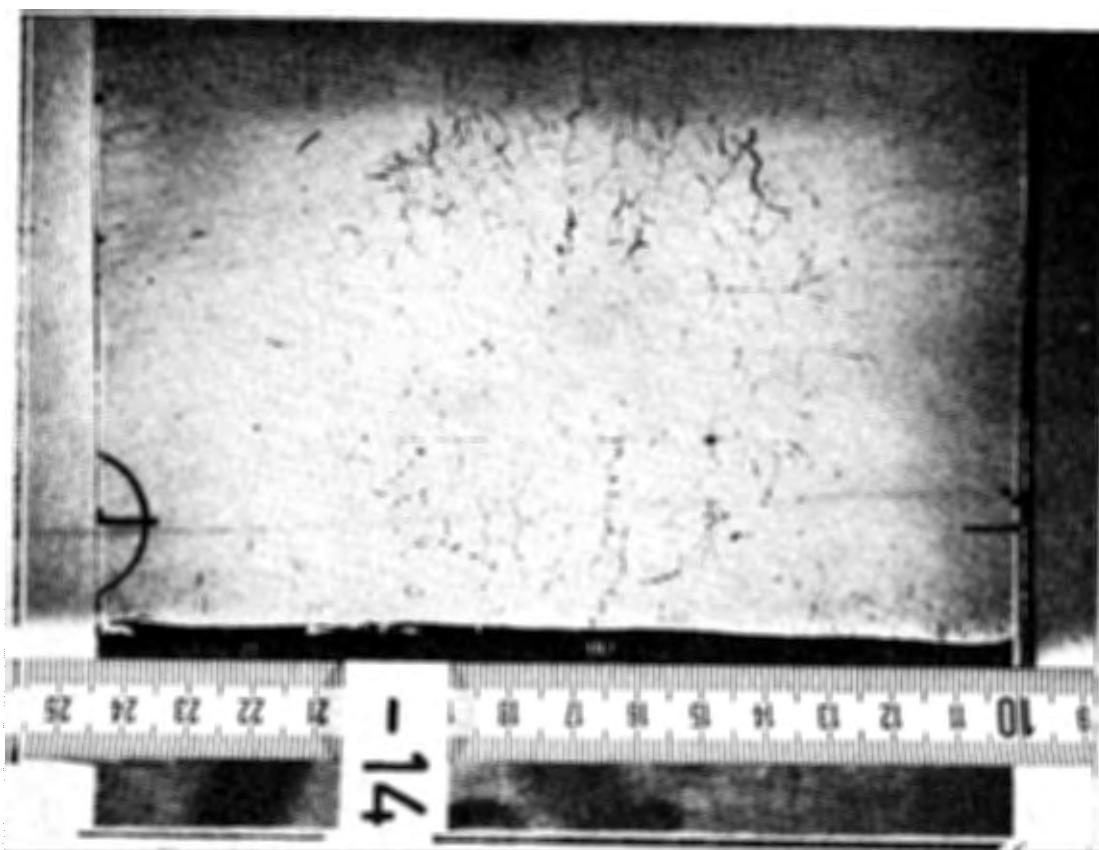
Specimen No. 14 : crack offset : + 28 mm
